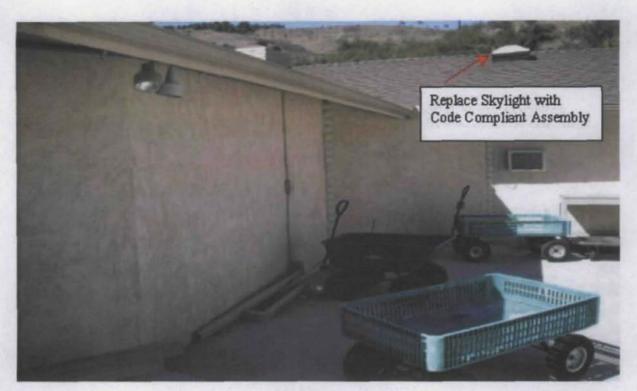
Wood Siding & Window Replaced with Stucco Backside on Office Building
